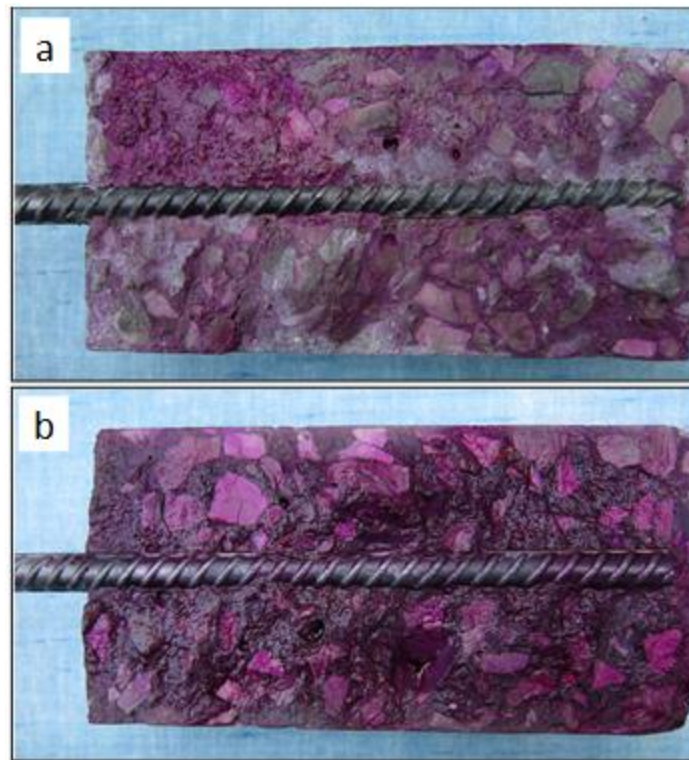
Visual appearance of concrete specimens sprayed with phenolphthalein: (a) Portland cement concrete, and (b) alkali aluminosilicate cement concrete.
